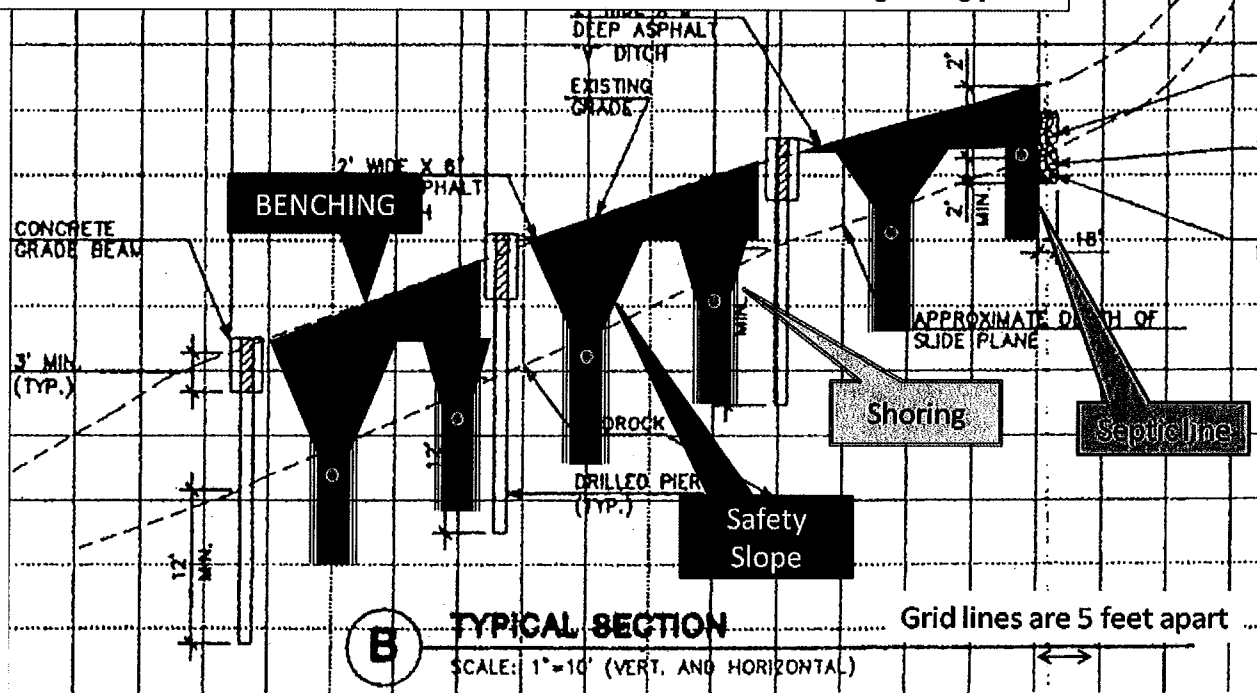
OSHA 1926-b-1.2 excavation and shoring
